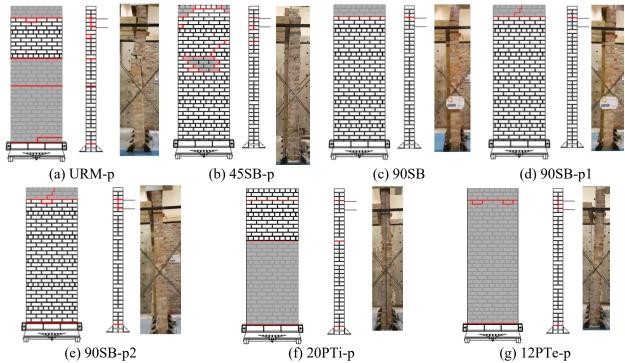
Screenshots showing crack-pattern survey and failure progression. Cracks are marked in red and collapsed areas are shaded grey
